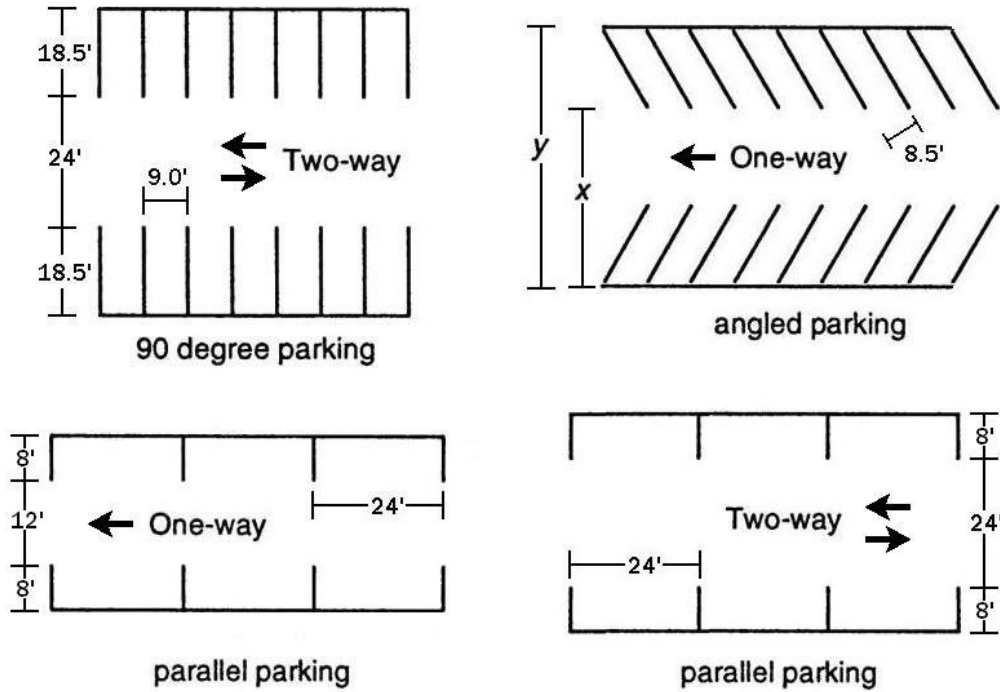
Off-Street Parking Layouts [see Section 4.01(E)(2a)]
